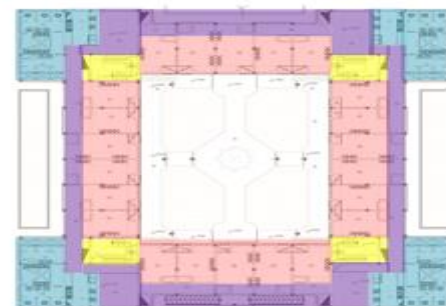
Block 3 typical plan (Source: Technical department of Semnan University).
